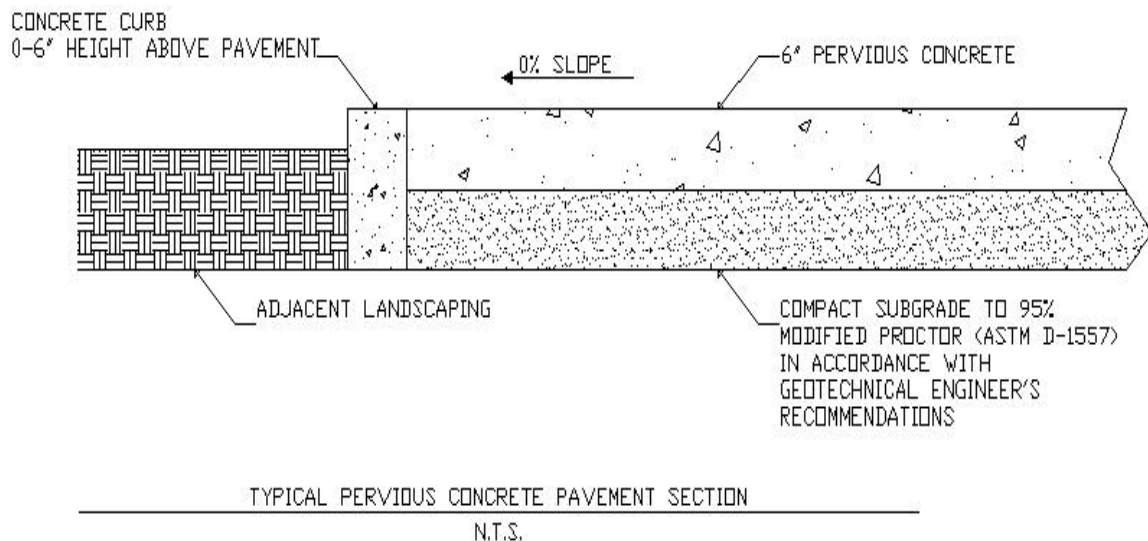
Pervious Concrete Parking Lot Construction Section
